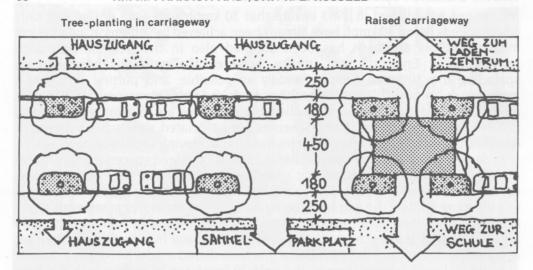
Plan of typical measures in a 30 kmph zone (source: Stadt Kassel, Germany)
